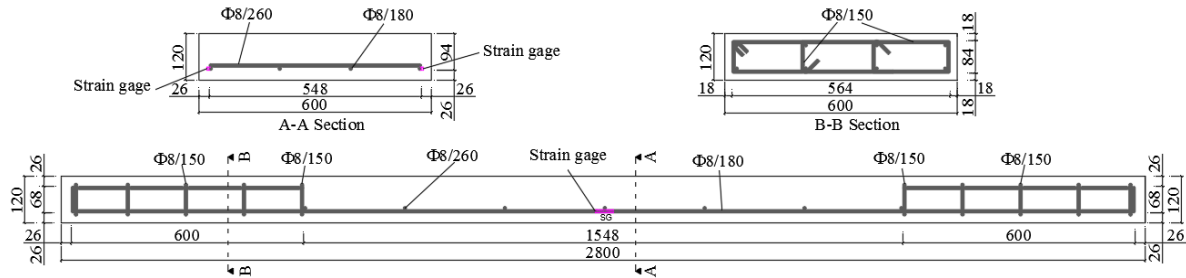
Reinforcement cage of the slabs (Dimensions are in mm)
